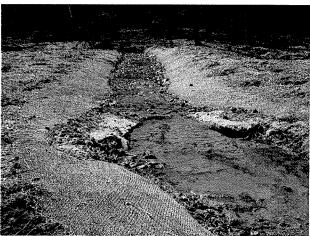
Looking downstream at cross vane installed at LT Station 5+90. (9/27/04)
